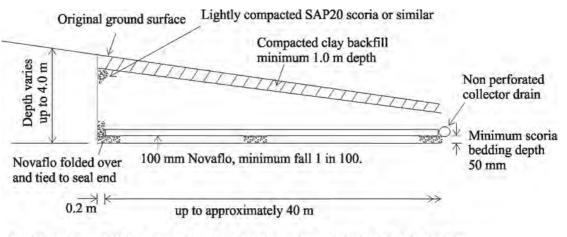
SCHEMATIC BUTTRESS TRENCH DRAIN DETAIL (NOT TO SCALE).
